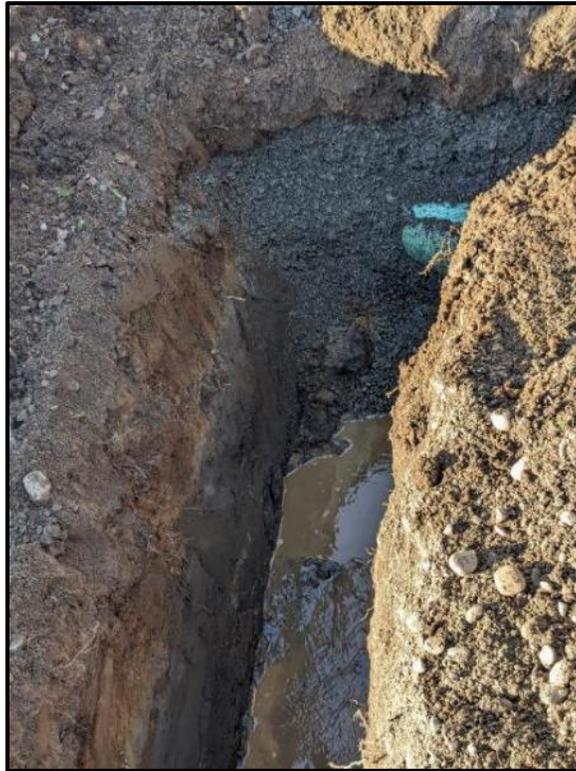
Photo of trench at bend with storm drain in background, facing west.
